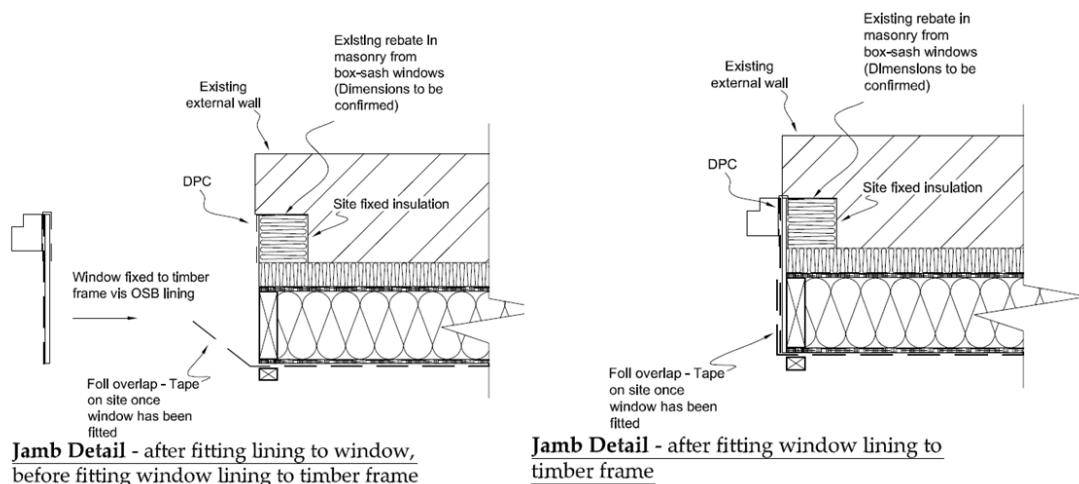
2: Detail of Windows before and after fitting lining to timber frame (Larrosa Marshall and Associates, 2010)
